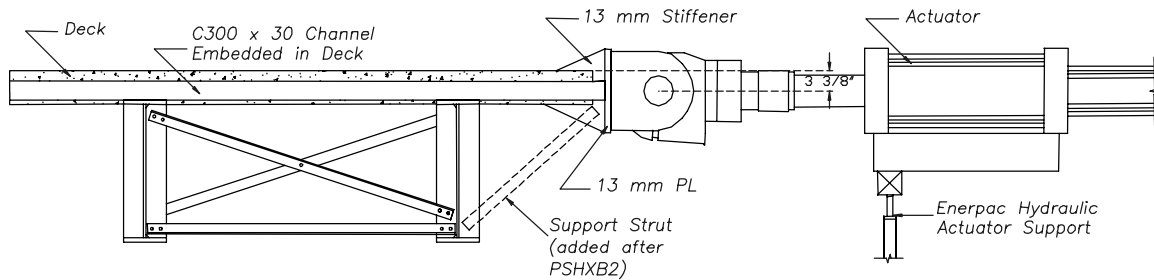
Actuator connected to bridge model at 1/3 points along length of bridge
